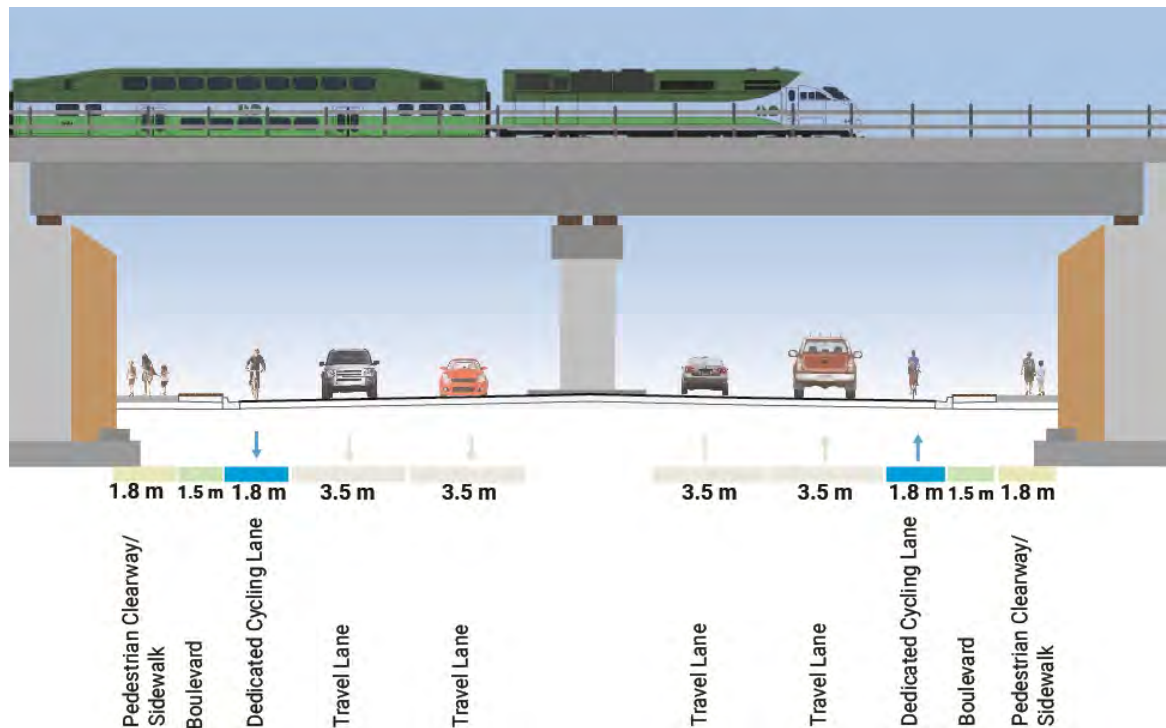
Cross Section of Alternative B – Underpass Grade Separated Crossing
